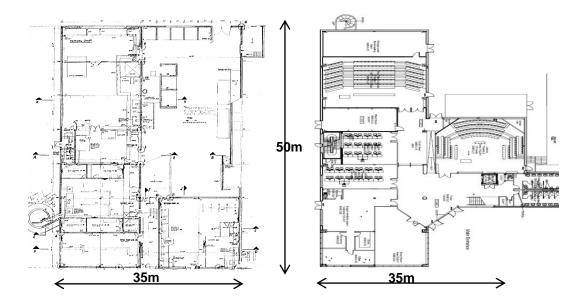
Ground floor plan of the foundry (1957) and the Stewart Mason building (2005)
